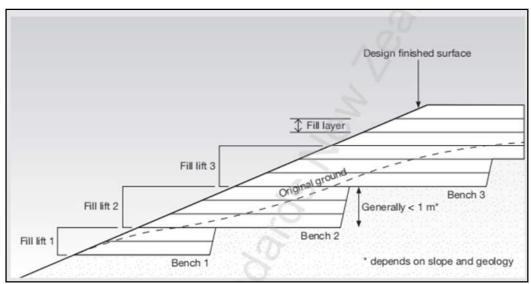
Typical Benching Detail, Figure 1 - Section C4.3.4 (NZS4431:2022).
